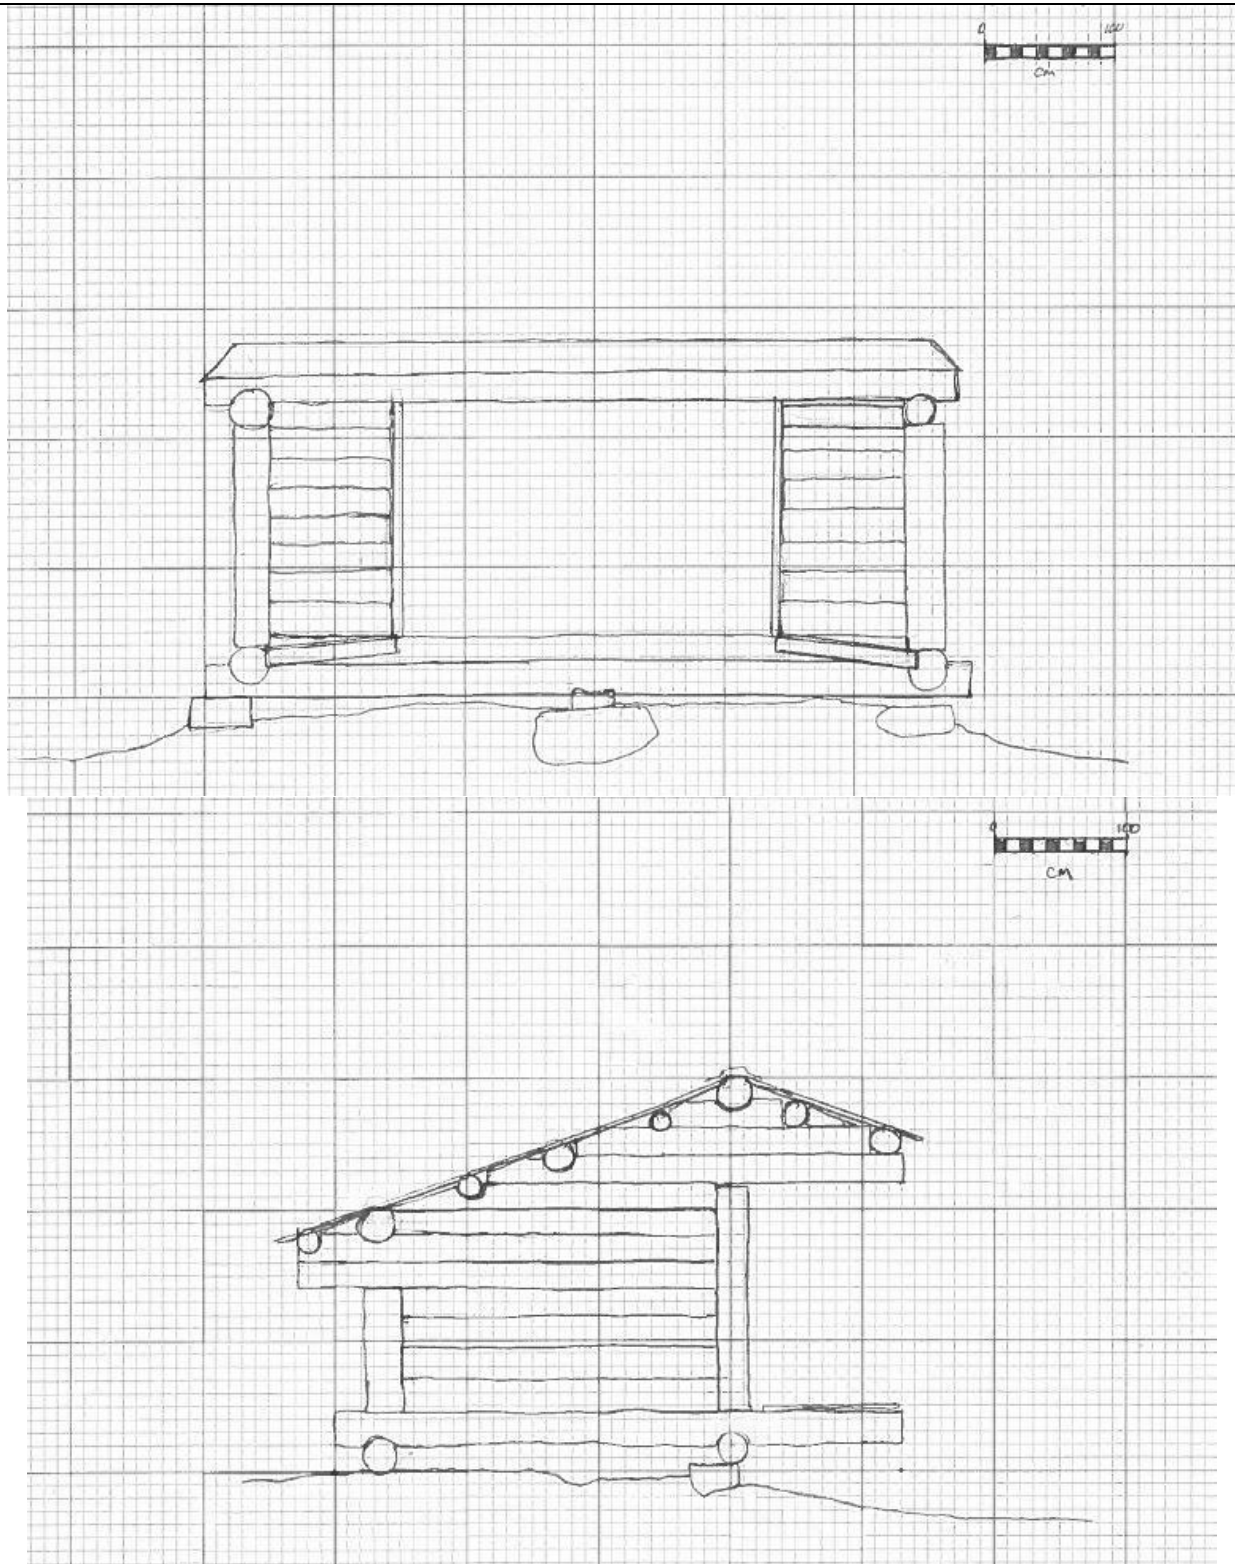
Beaver Brook shelter drawing. Above: East (front) elevation. Below: South side elevation. May 23, 2012.
